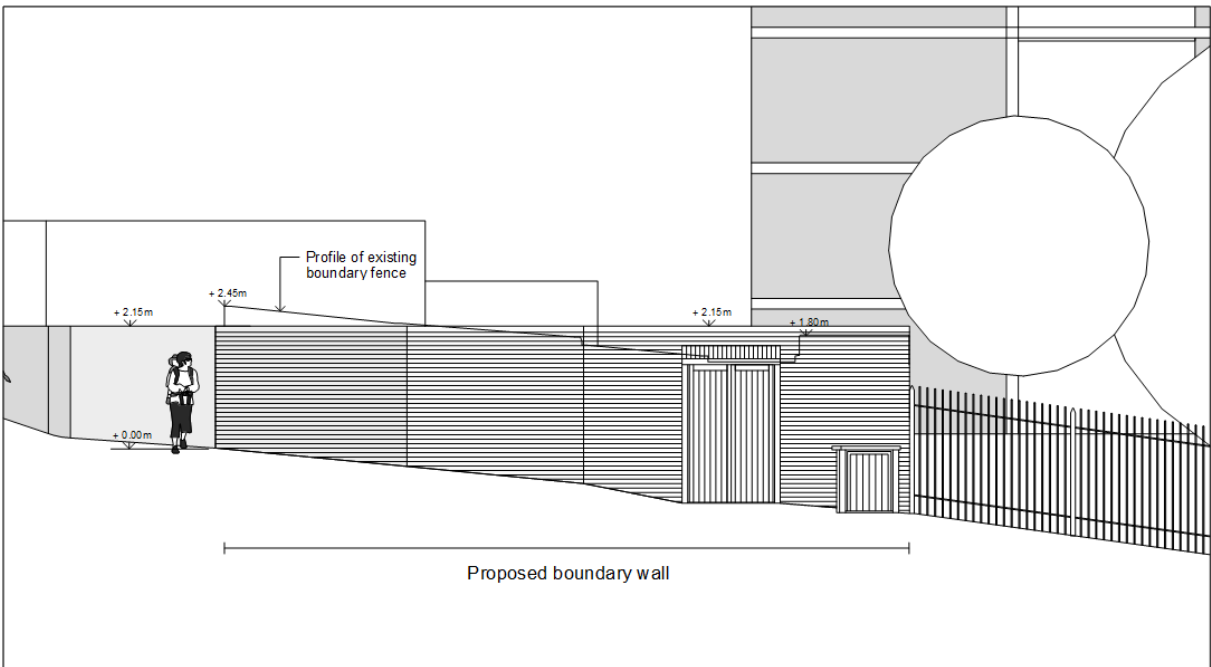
Elevation of proposed boundary wall with profile of existing fence overlaid for the purposes of comparison
